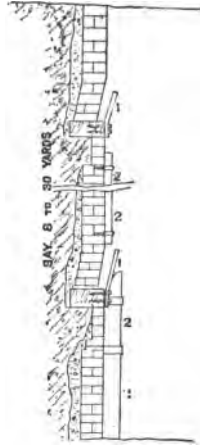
Section of shaft wall. 1, water-garlands; 2, water-pipes.
